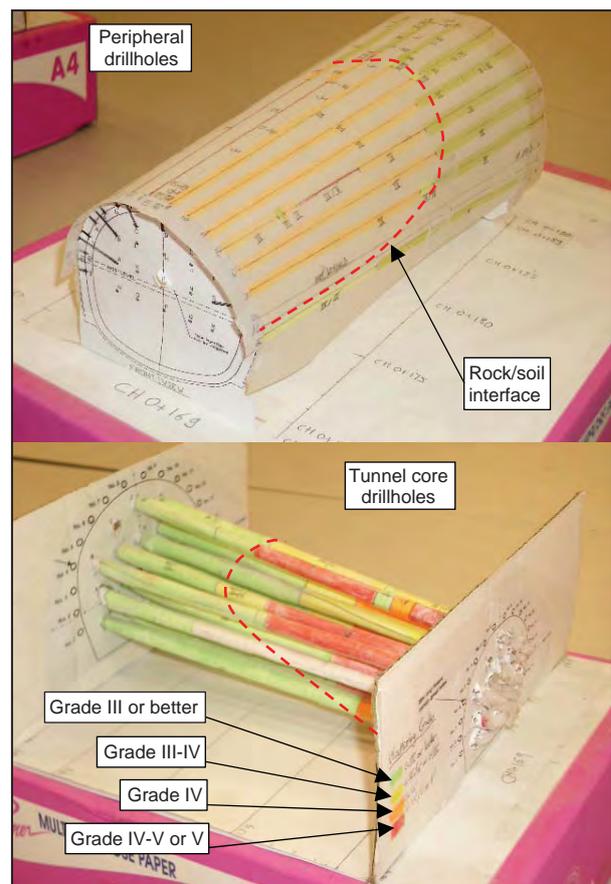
3-D models of a rock/soil interface based on logging of cuttings from drillholes for pre-reinforcement and grouting (models by Gammon Construction Ltd)
